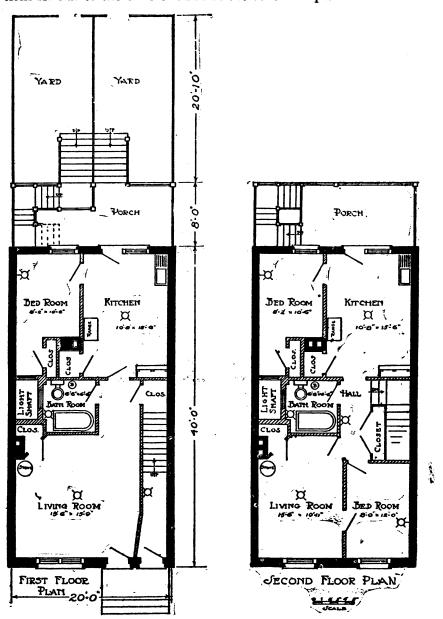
Two flat houses of the Washington Sanitary Improvement Co. Rent, \$10 for first floor; \$12 for second floor.
